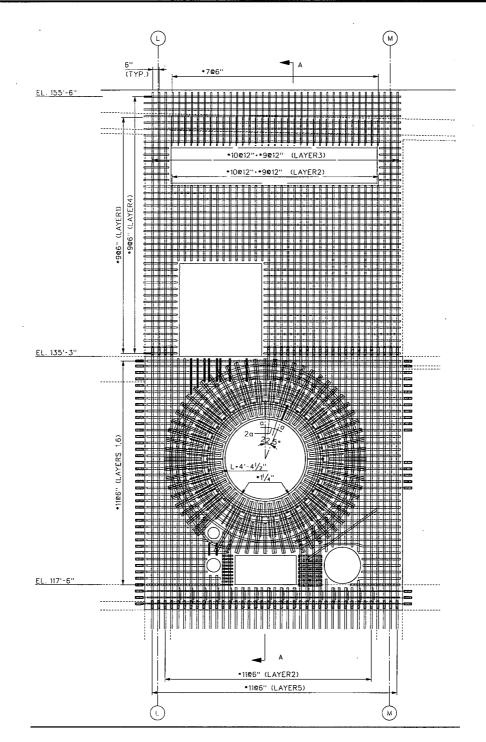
Concrete Reinforcement in Wall 11 (Sheet 1 of 3)
